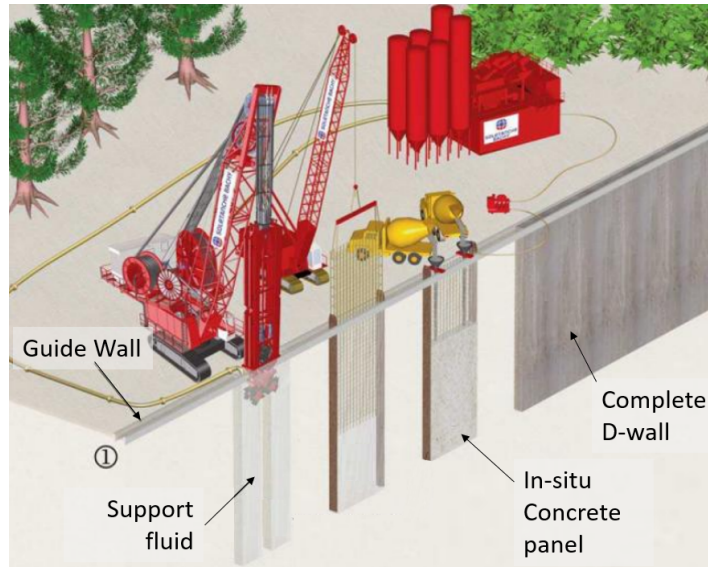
Diaphragm wall construction sequence (<http://www.railsystem.net/diaphragm-wall-construction/>).
